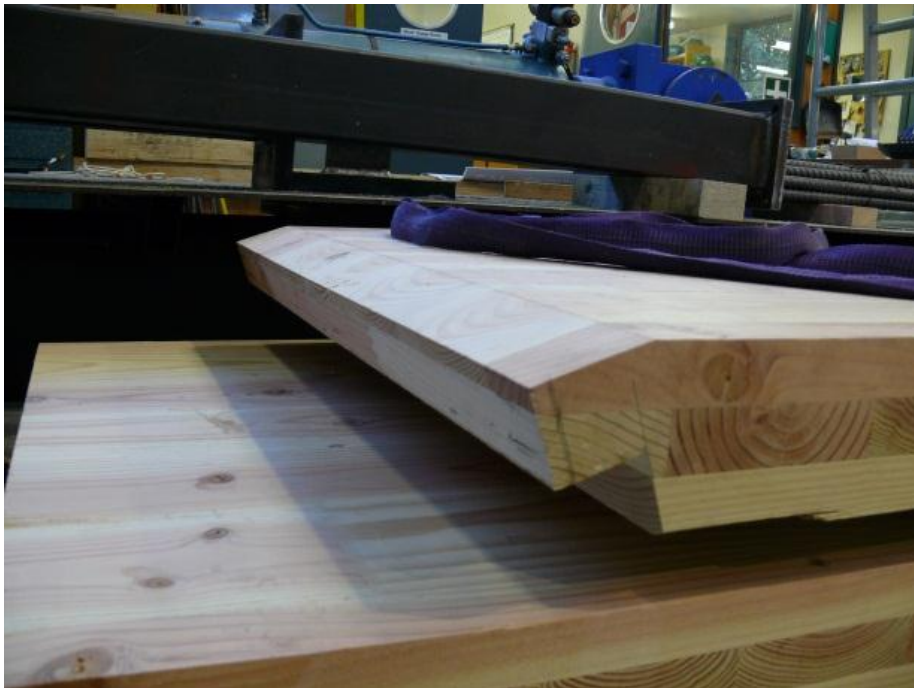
Loading beam components, screwed inset plate for High Seismic specimens
